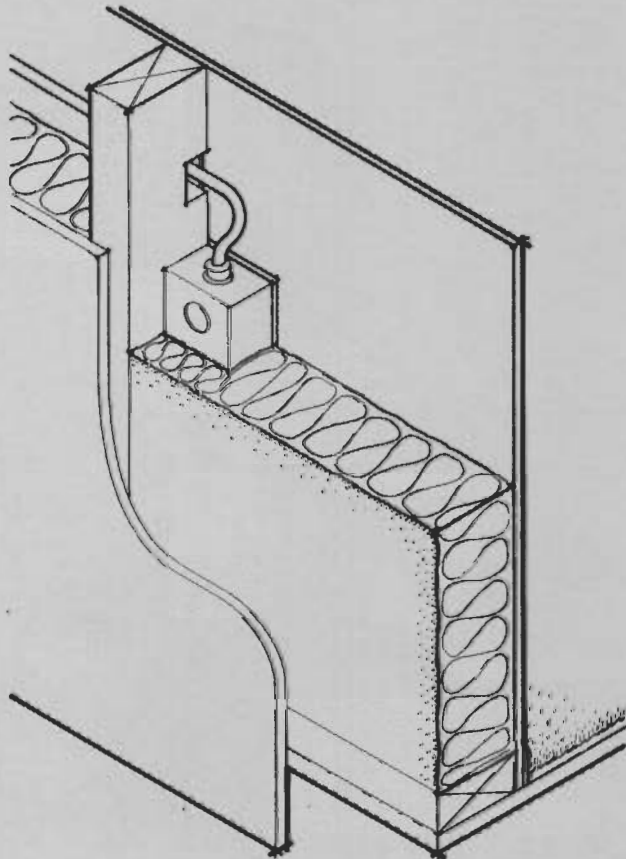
"AFFORDABLE HOUSING THROUGH ENERGY CONSERVATION"; WALL DETAIL
